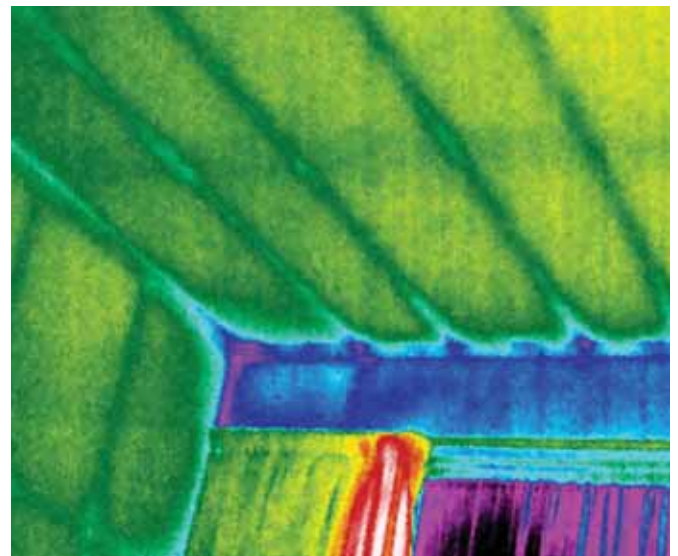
Thermograph of a ceiling showing cold bridges at the ceiling joists.
